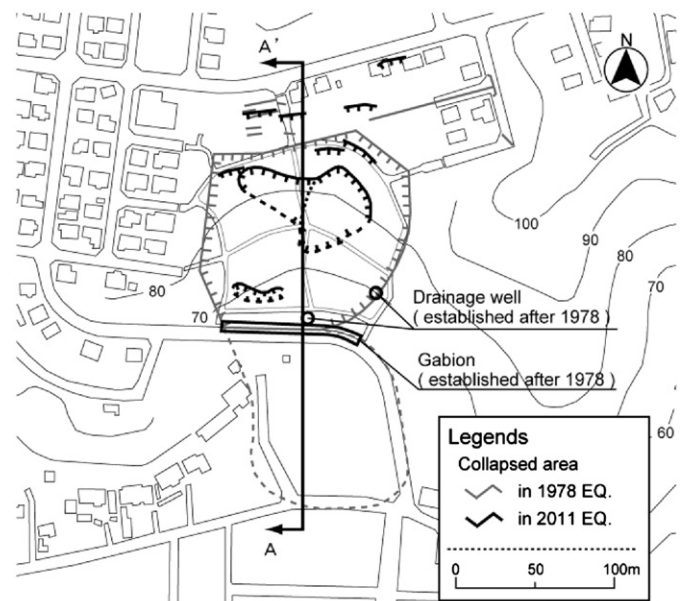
Plan view of Midorigaoka residential land (Kotobukiyama).
